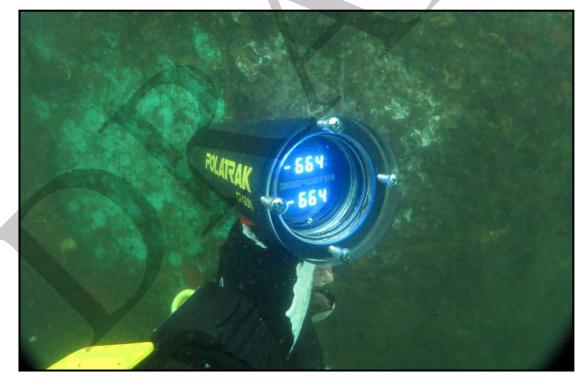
Electrical potential measurement at steel king pile at Pier 1.
